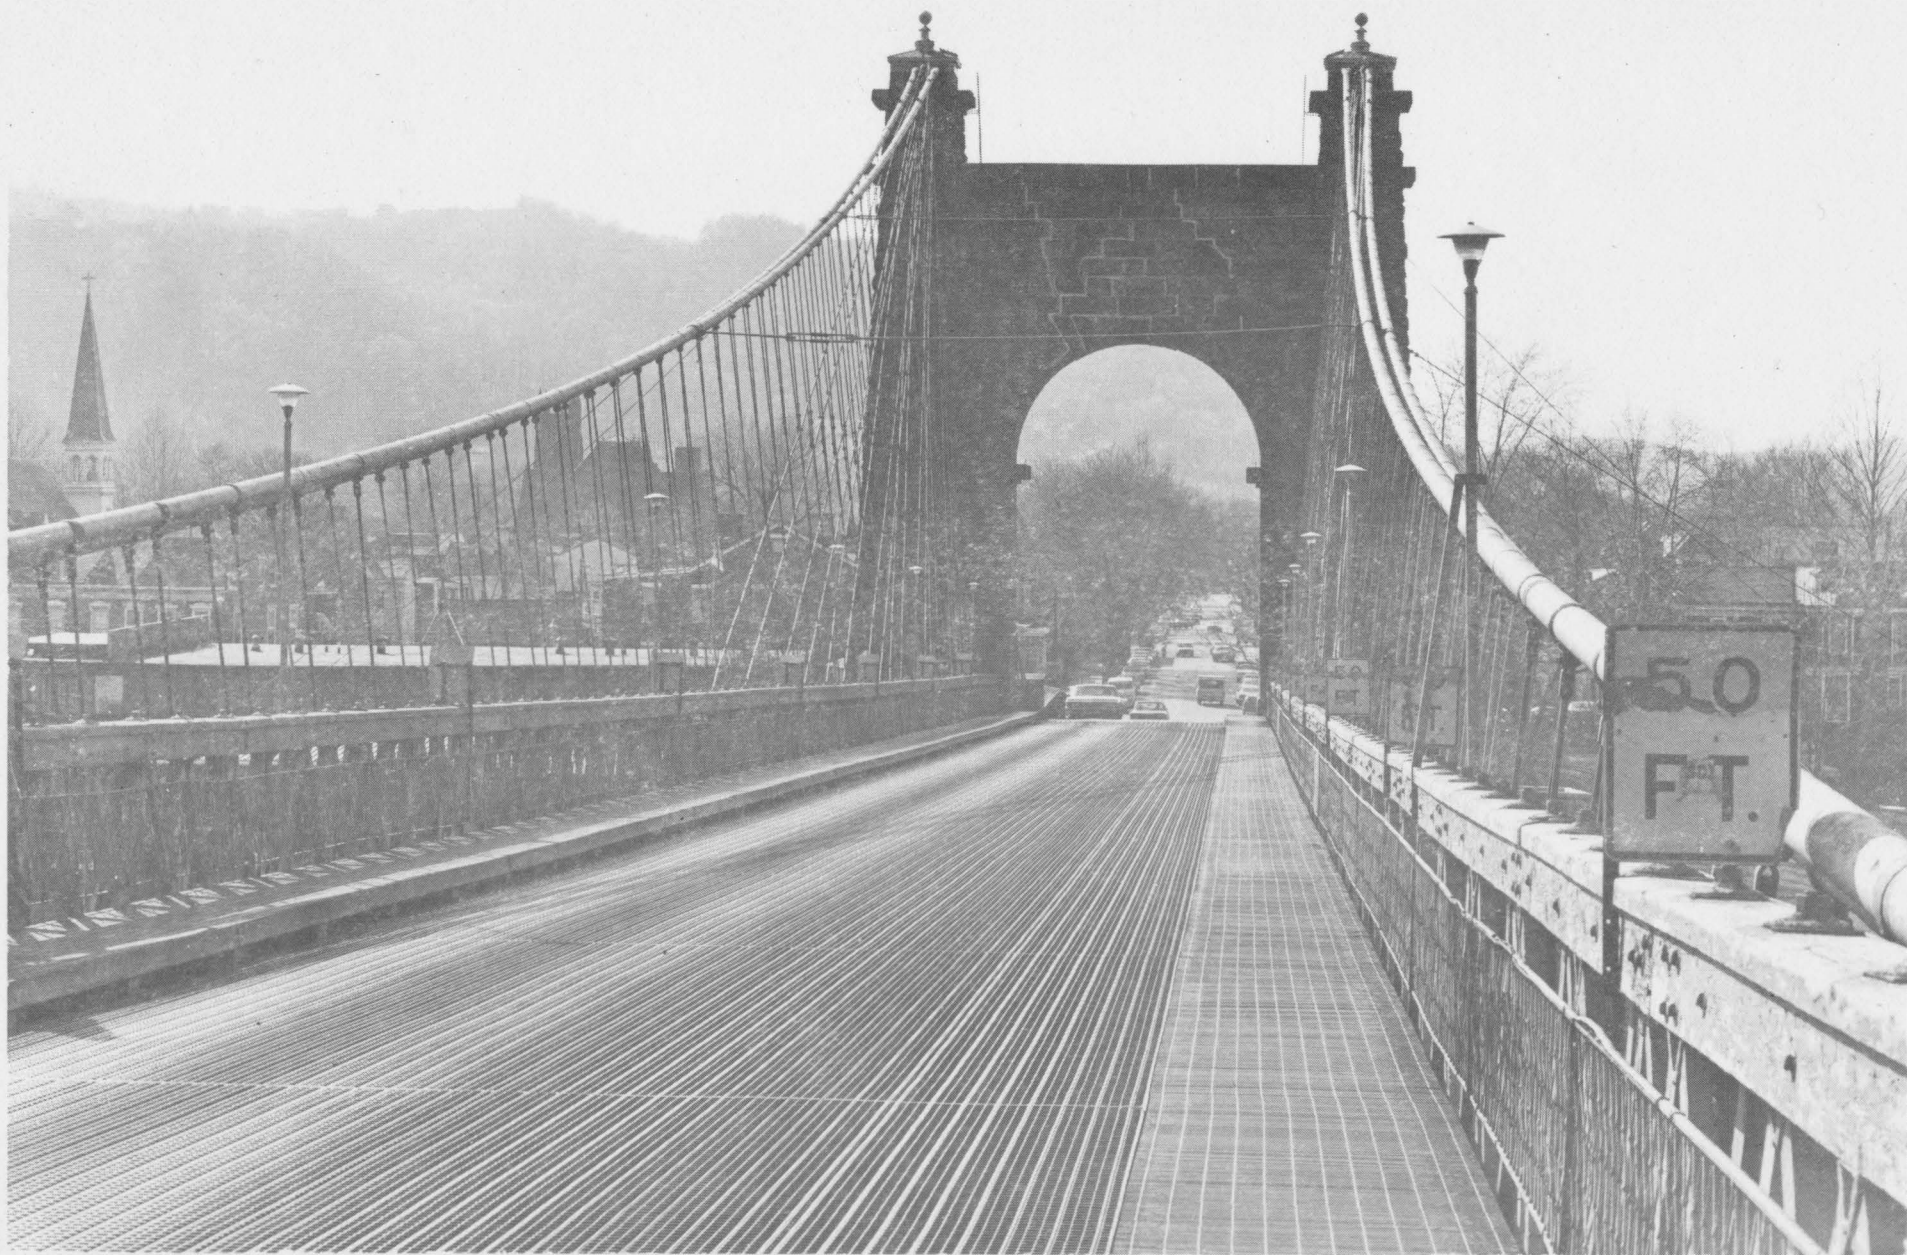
Wheeling Bridge, general view from deck - William E. Barrett
